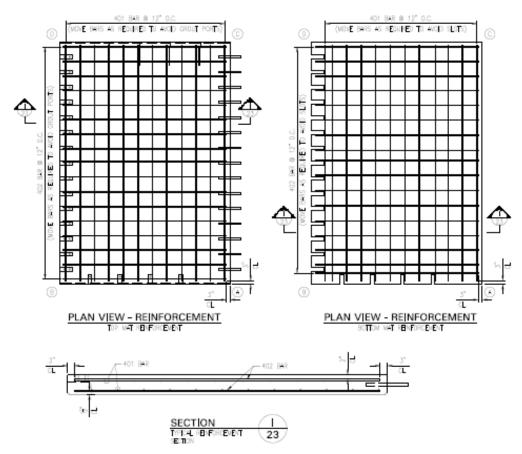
Diagram. Typical panel shop drawings (reinforcement details).
